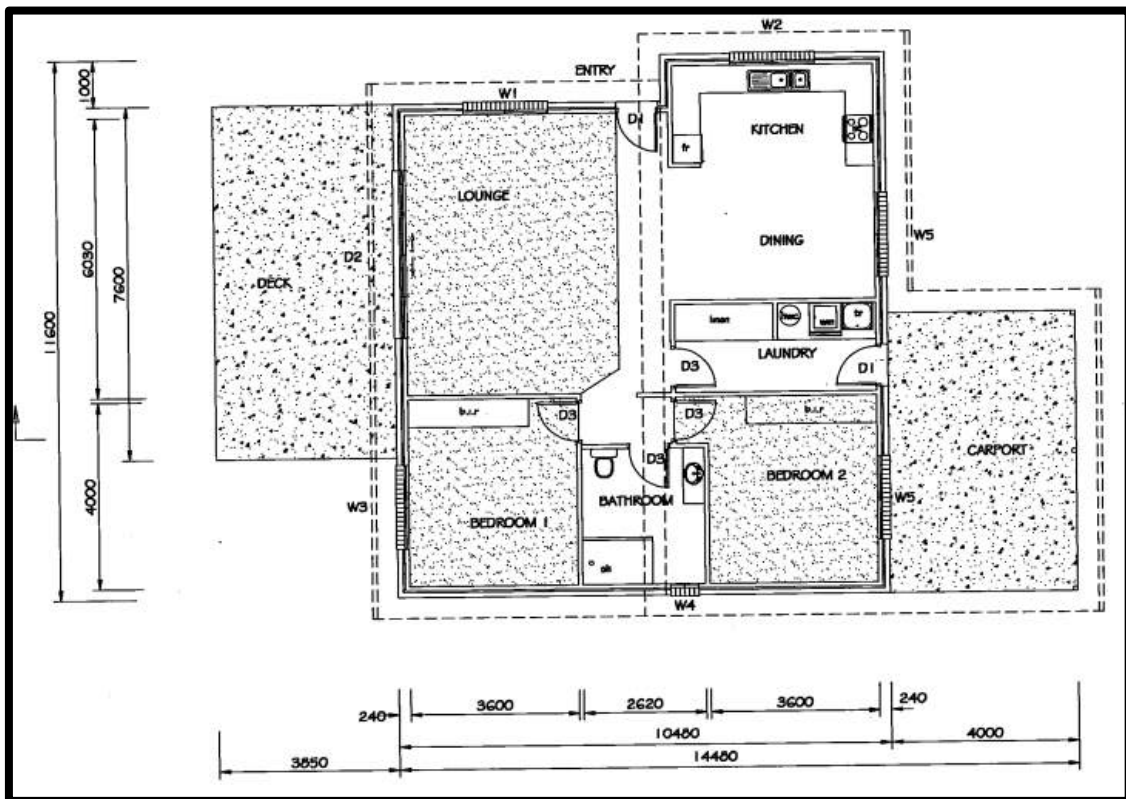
Proposed floor plan (Wood Design and Drafting, 2016)
